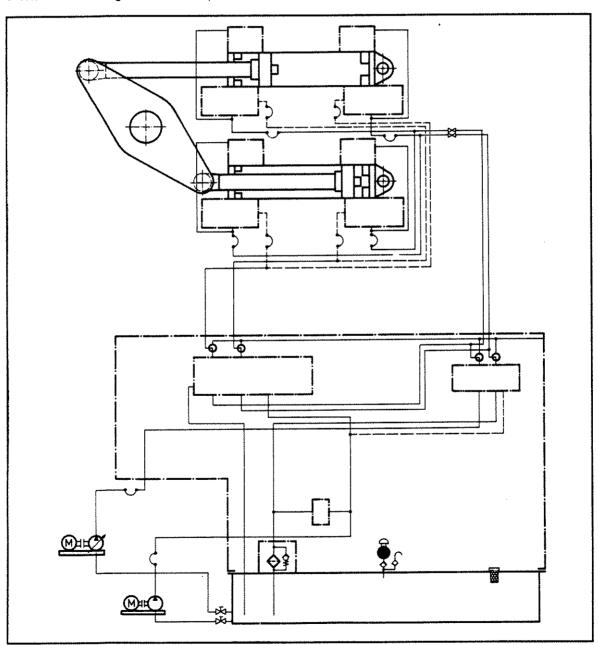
Shuaiba Maqal road bridge, hydraulic rotating drive system
